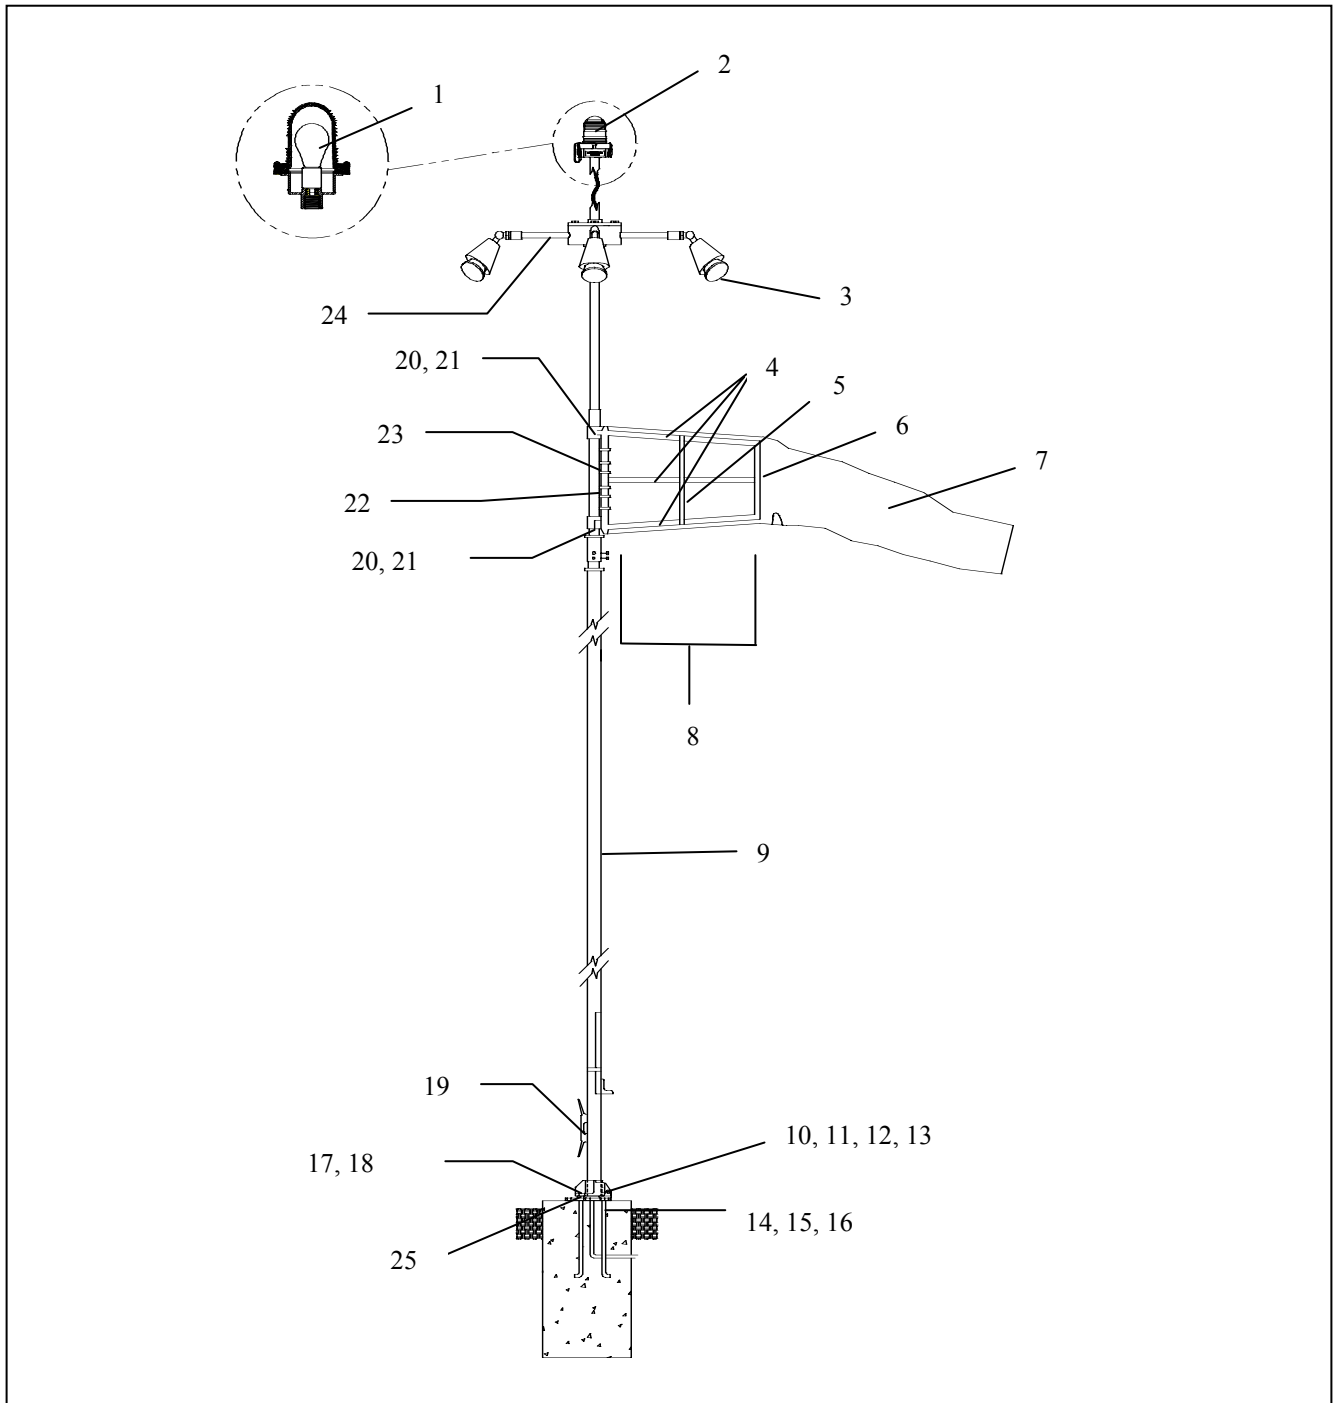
L-807 Wind Cone (With External Lighting Assembly and Obstruction Light)
